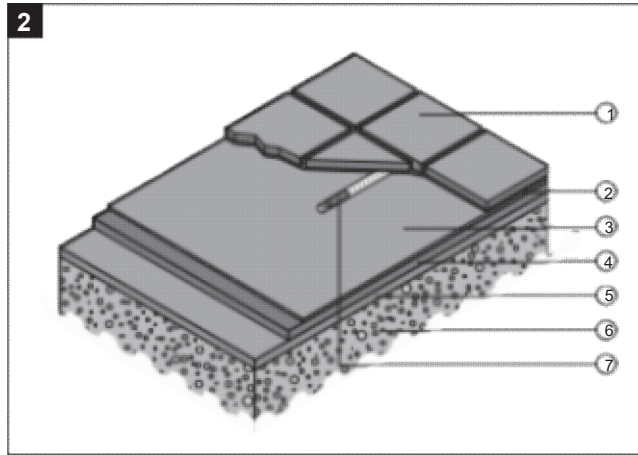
1 tile glue + floor covering (e.g. floor tiles)
